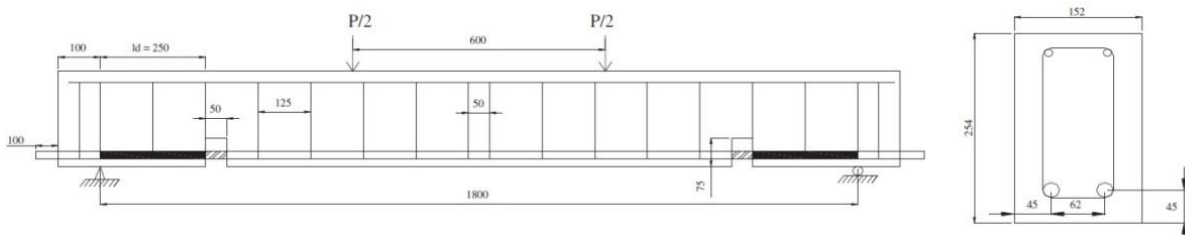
Longitudinal and cross-sectional details of the beam-anchorage Rteil et al. (2011)
